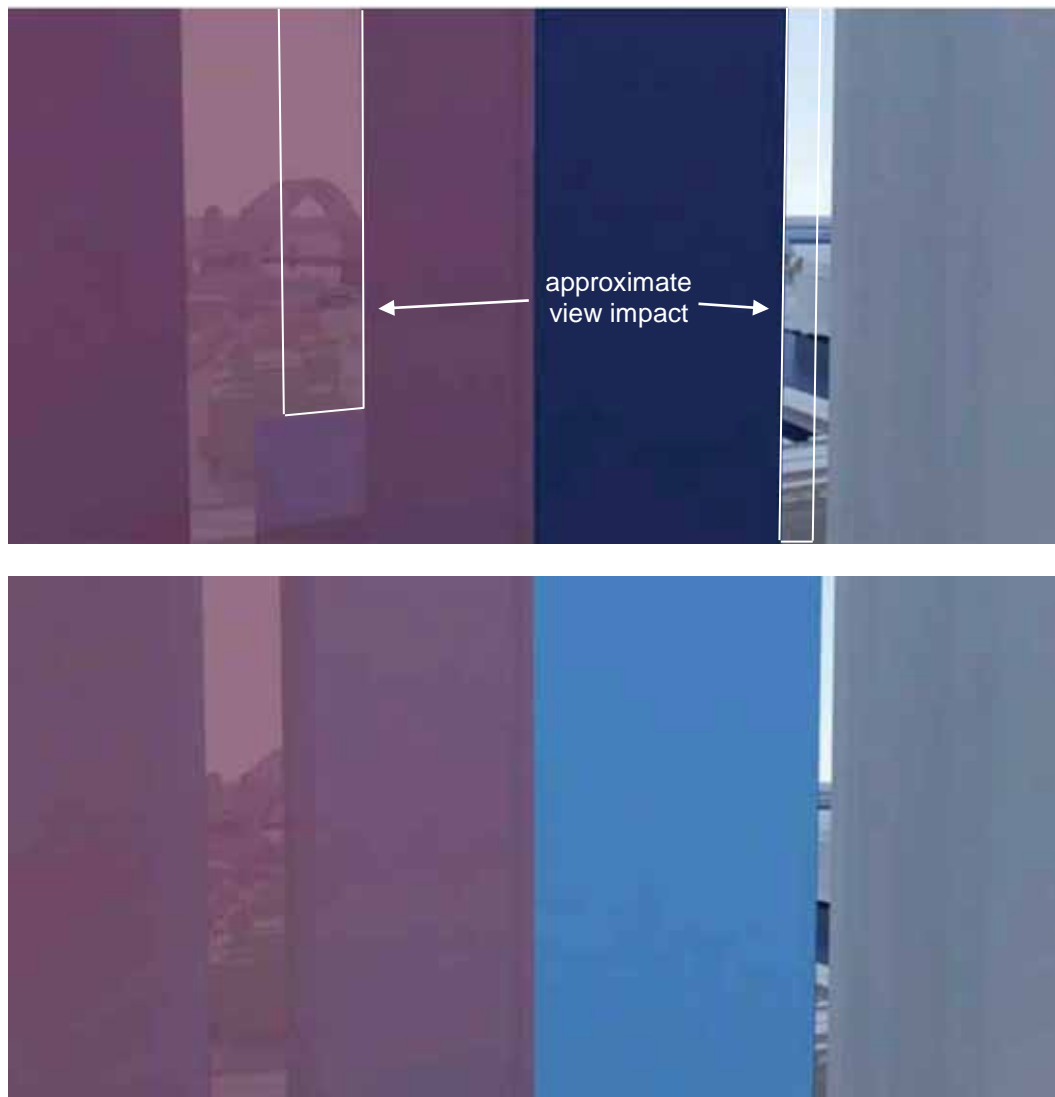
Currently existing and currently approved buildings (above) vs proposal (below), as viewed from the future Lend Lease site at RL 70m (Source: Applicant's EIS)
